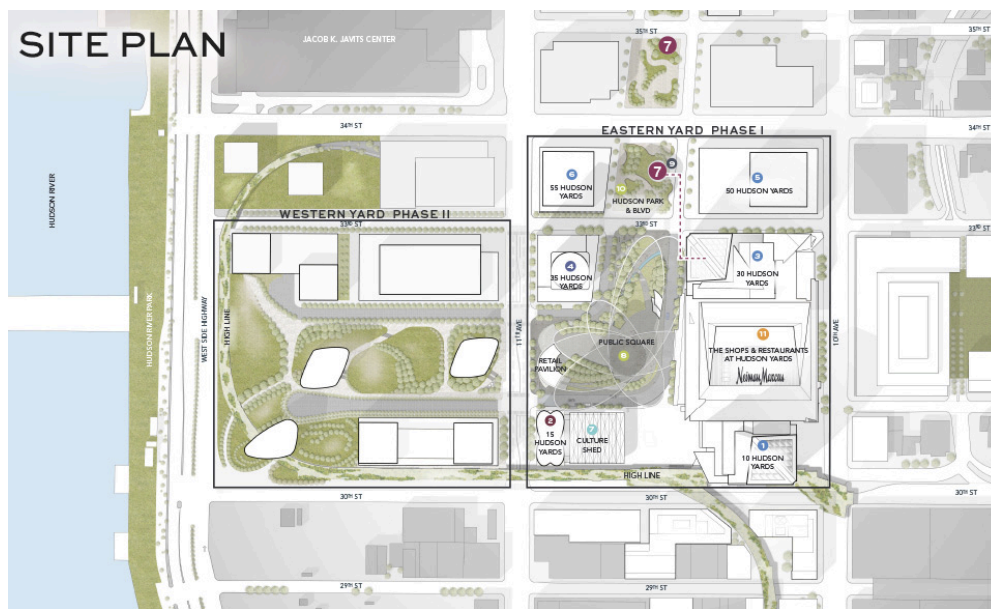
Hudson Yards Proposed Site Plan. Penn Station lies to the east of the site. (Hudson Yards, 2016)
